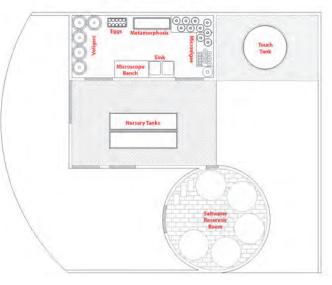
Floor plan layout of the queen 32 m² conch pilot-scale hatchery and nursery facility at Naguabo Commercial Fishing Association, Puerto Rico.
